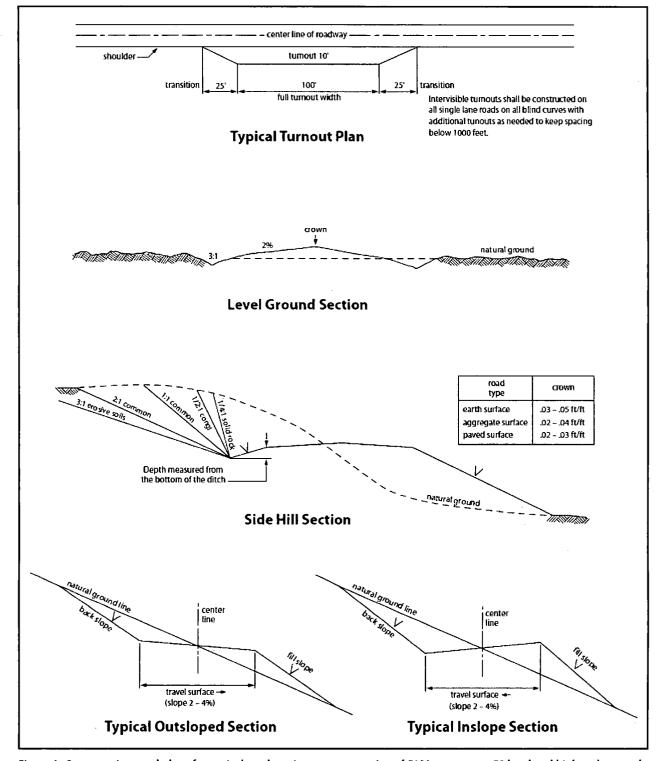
Cross-sections and plans for typical road sections representative of BLM resource or FS local and higher-class roads.
